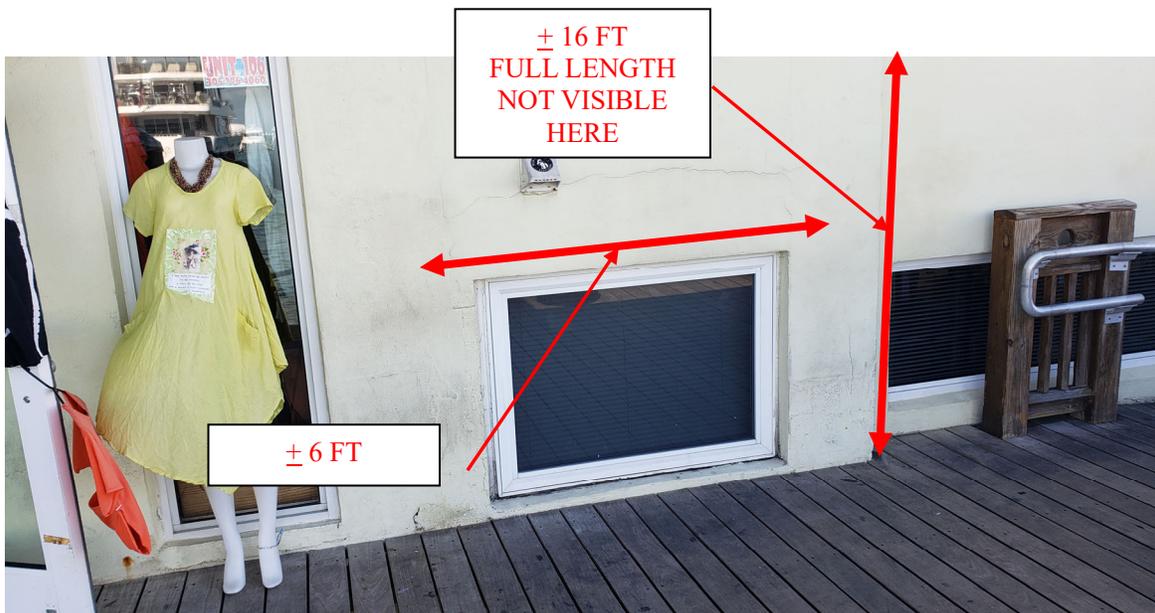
Location 32: Approximately 16 ft long new 16x12 concrete column. See detail 6/S104. Approximately 6 ft long new 12x16 horizontal tie-beam/header. See detail 8/S105 - tie-beam /header replacement detail.
